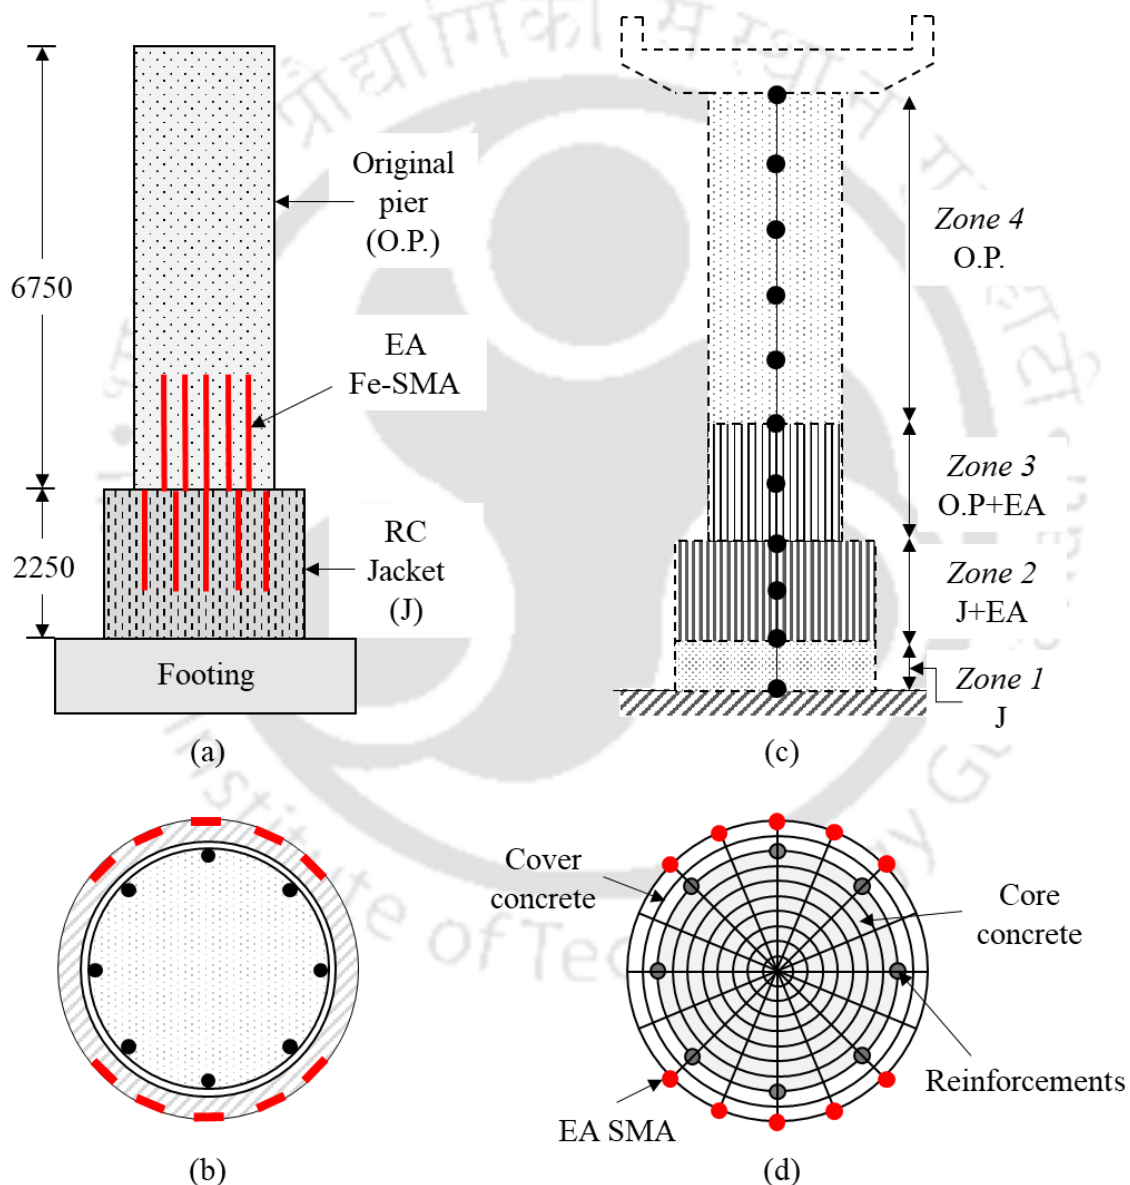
(a) Prototype Specimen EA; (b) cross-section; (c) FE model and (d) fibre section of the model
